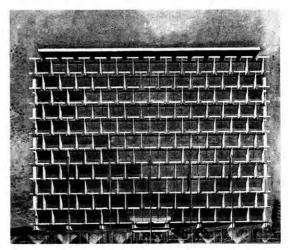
Competition Drawings, Howlett and Bailey, 1960 – Elevation/Section sheet 7.
